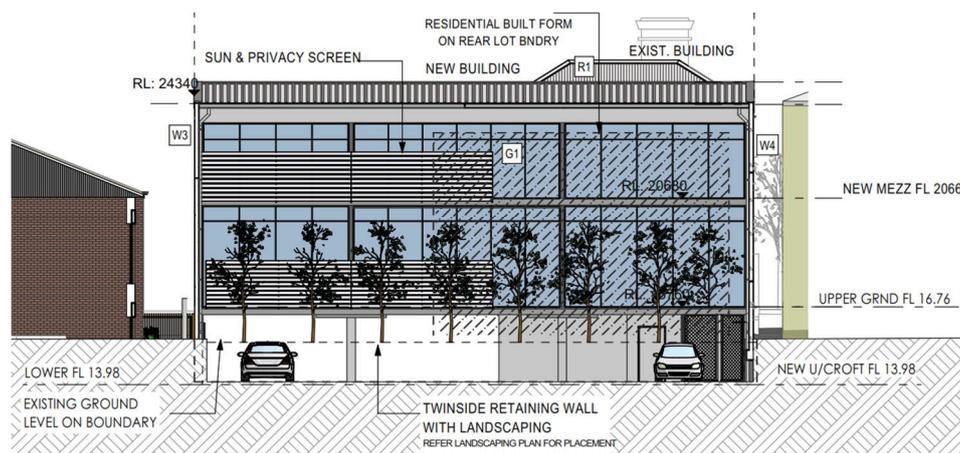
North-east elevation plan of No. 276 Newcastle Street, Perth, showing the previously approved privacy screening.
